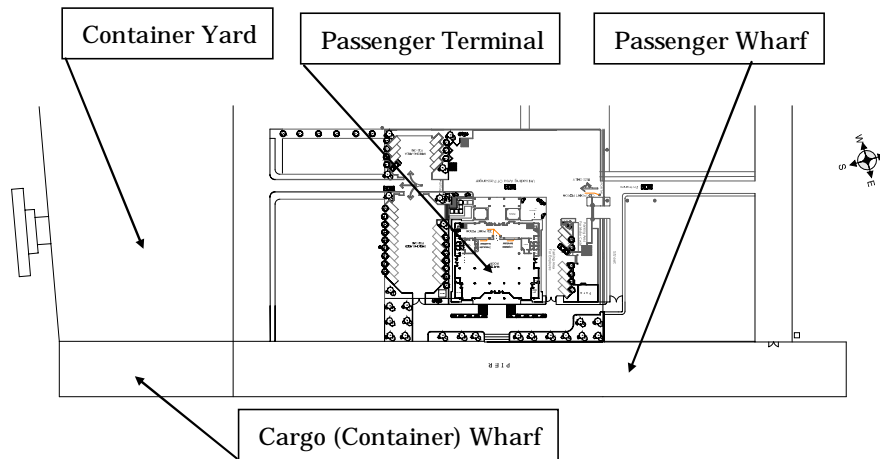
Existing Layout at Benoa Port(Passenger Terminal)
